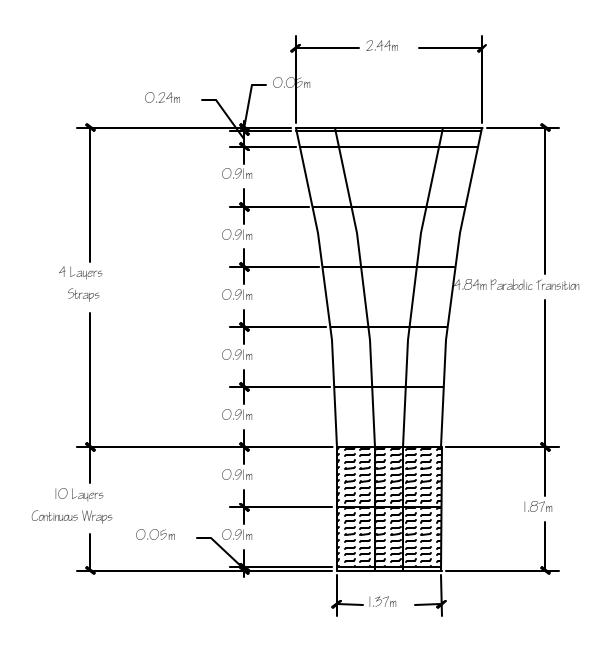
4 Glass Fiber-Epoxy Jacket Elevation
